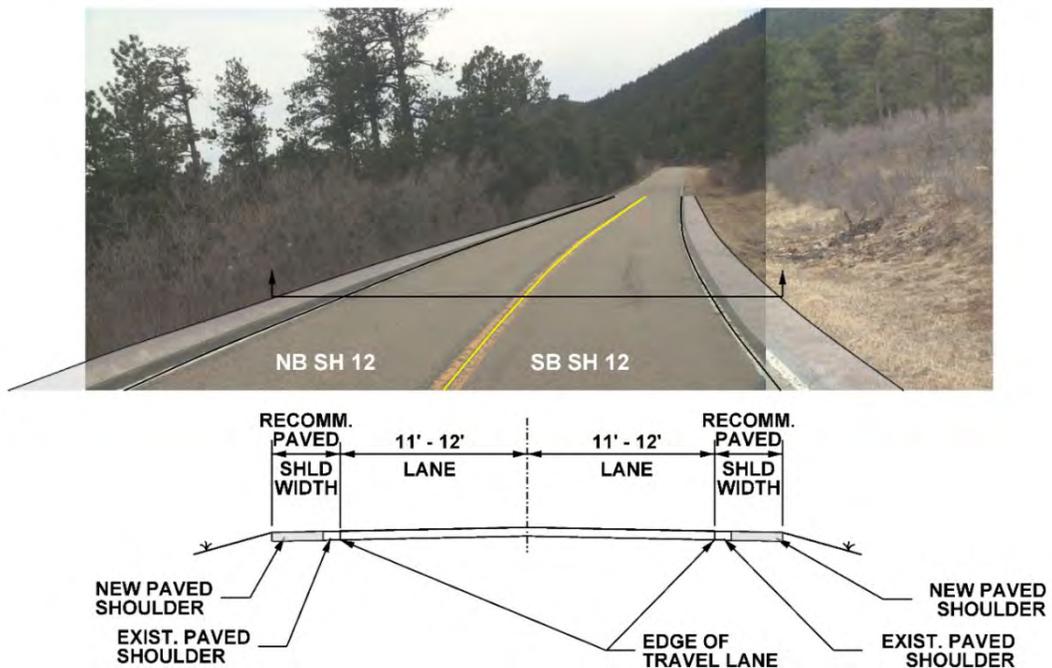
Mining Segment - SH 12 Safety Typical Section Location Near MP 50
